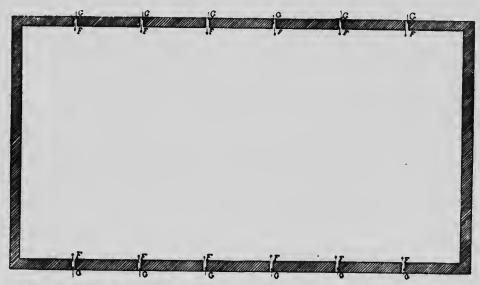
Plan devised by Prof. King, of Wisconsin. Horizontal projection showing fresh air inlets.
